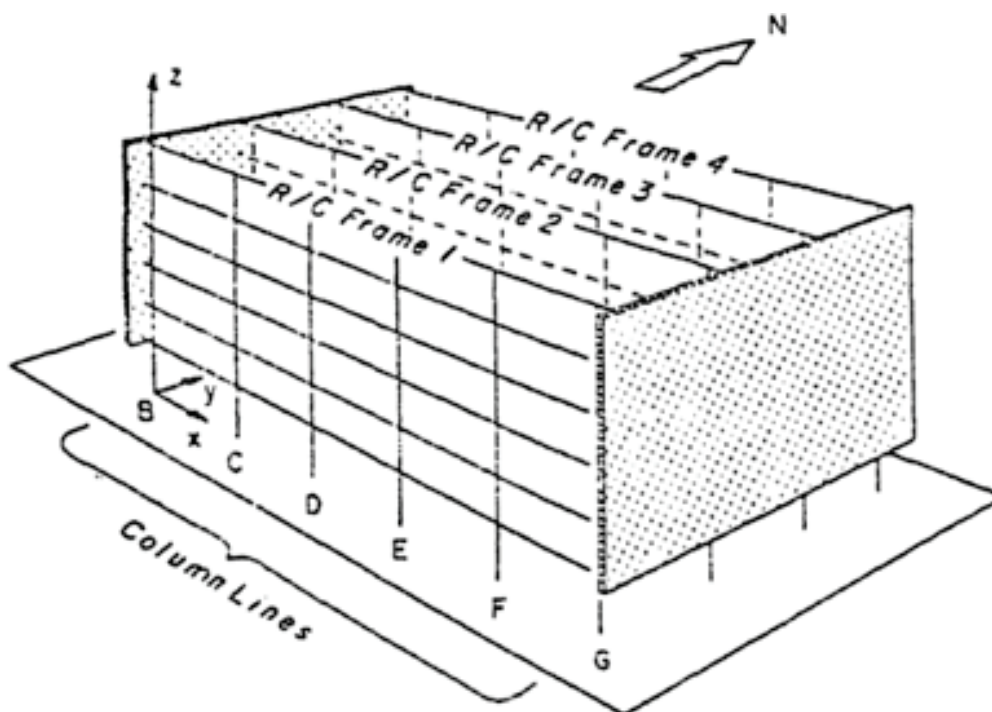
Schematic illustration of study building (Pardoen et al., 1979).
